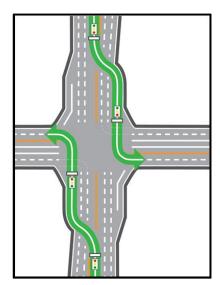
Layout of the CFI designs being considered for the intersections of Wadsworth and 38<sup>th</sup> and 44<sup>th</sup> Avenues.
